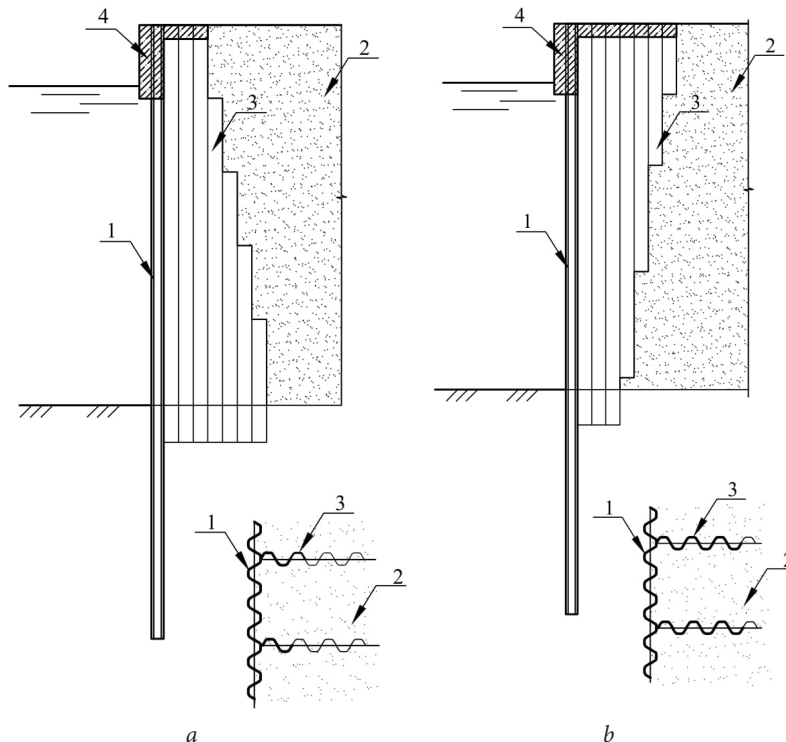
Tongue-and-groove wall with buttresses: a – trapezoidal shape with extension downwards; b – trapezoidal shape with an extension upwards; 1 – front tongue-and-groove wall, 2 – backfilling, 3 – transverse rows of piles
